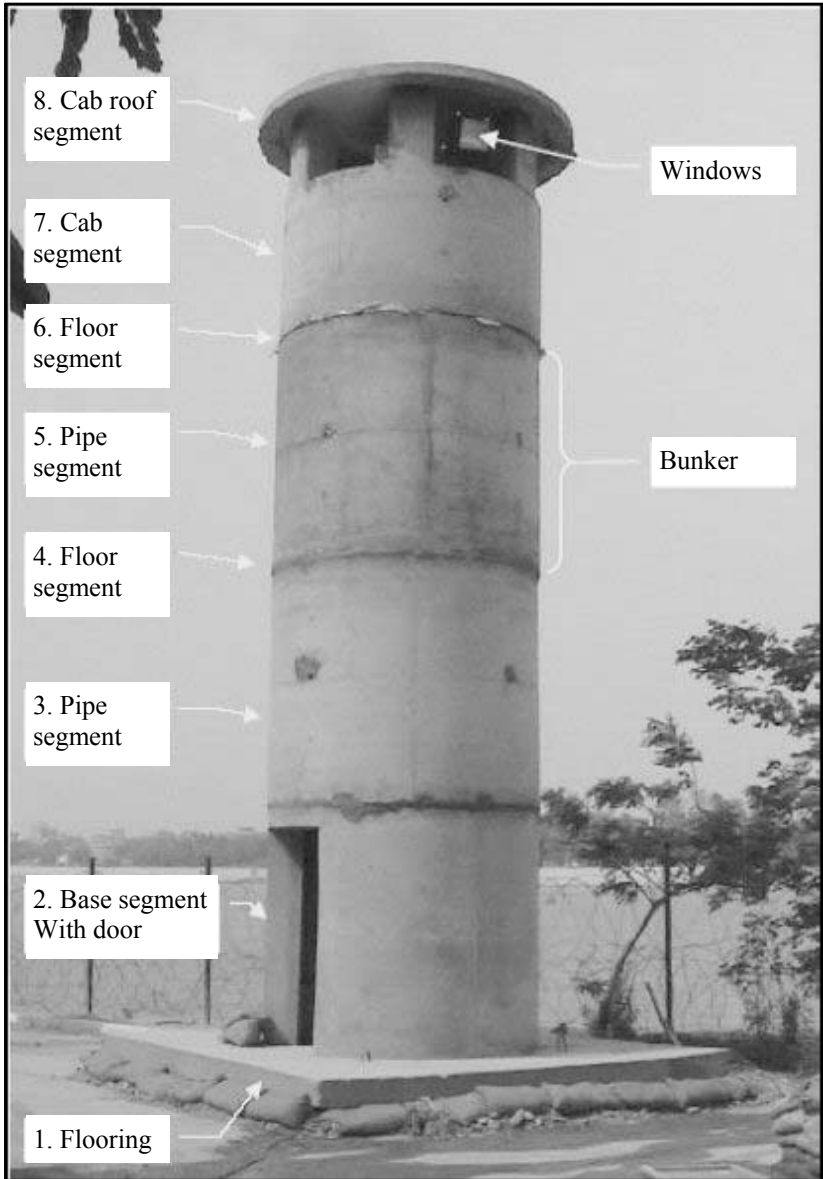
Precast Concrete Pipe Guard Tower Design
